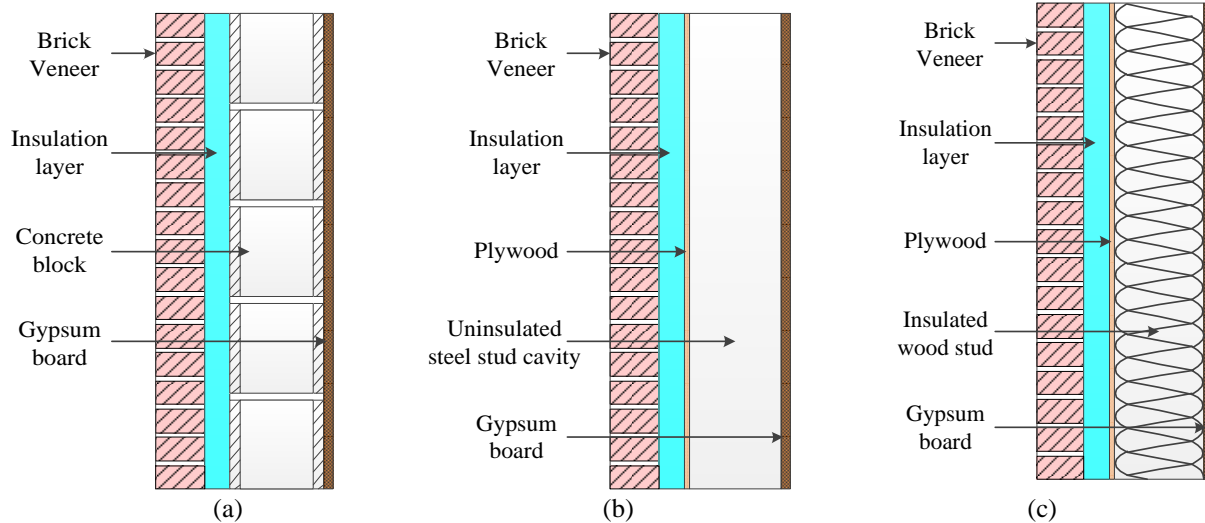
Typical configurations of exterior walls (a) Masonry wall, (b) steel frame wall, and (c) wood frame wall (replotted from [43]).
